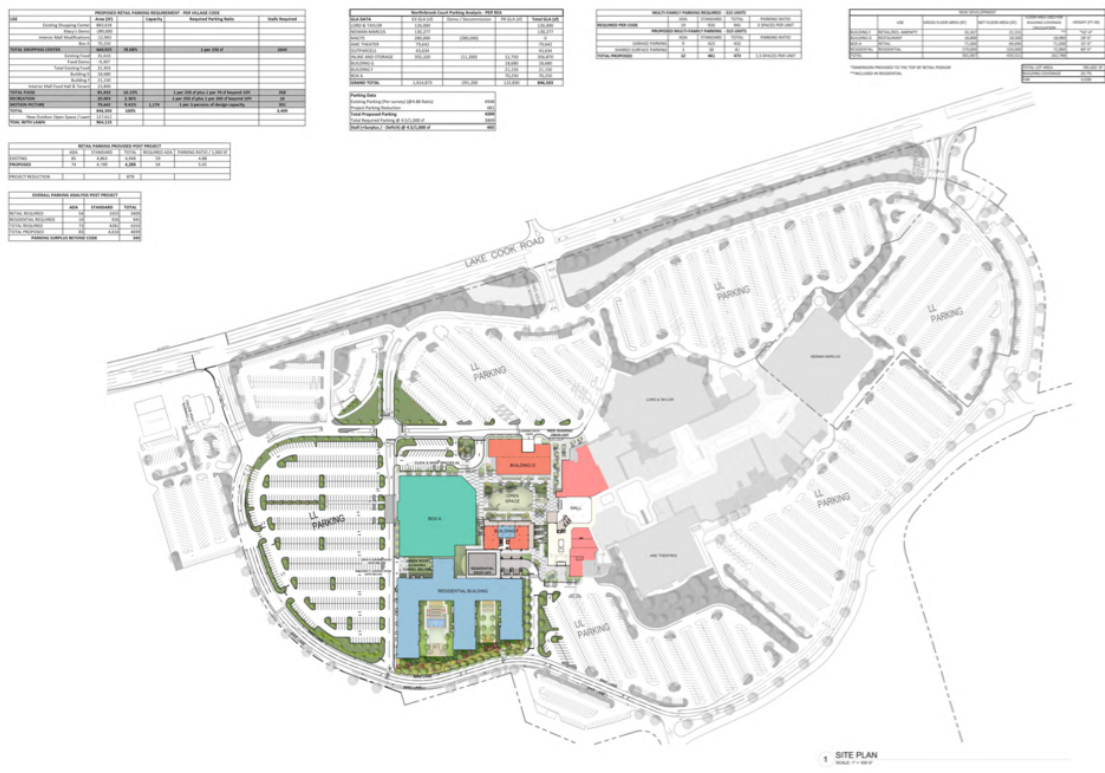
Northbrook Court Proposed Site Plan. 2018.
